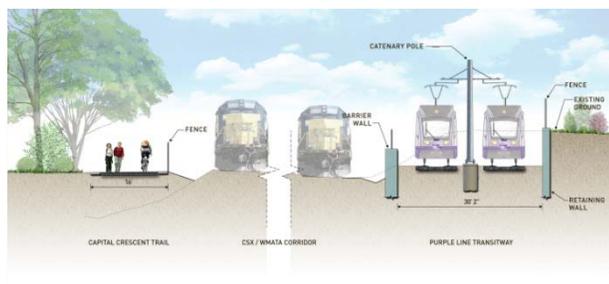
Typical Section in Georgetown Branch Right-of-way
